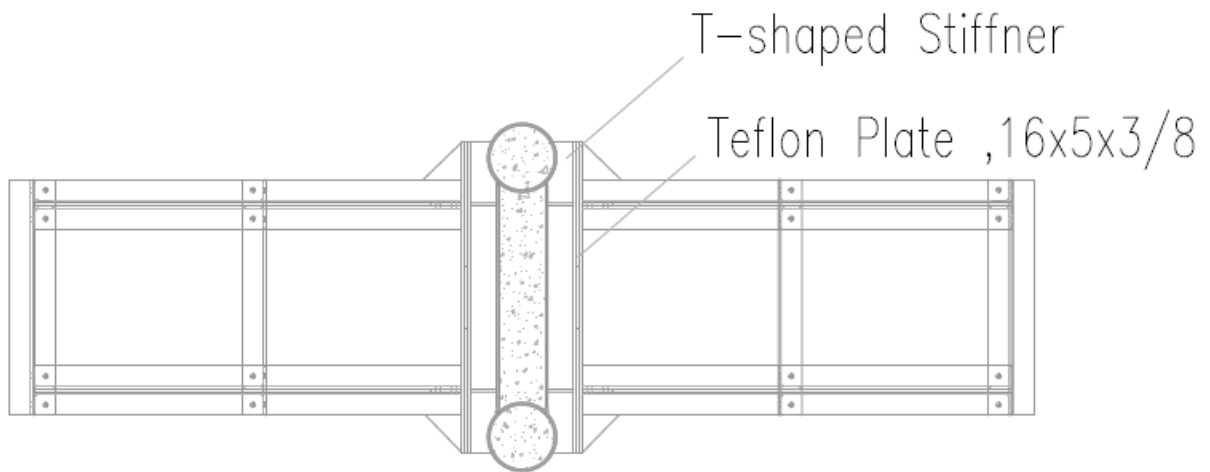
Plan of Lateral Support System in Case of Group B Specimen
